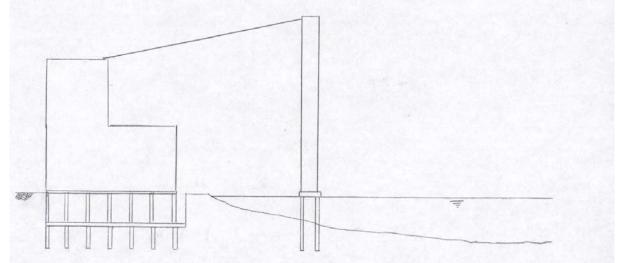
Stage 5: Placing of first deck elements and the abutments.
